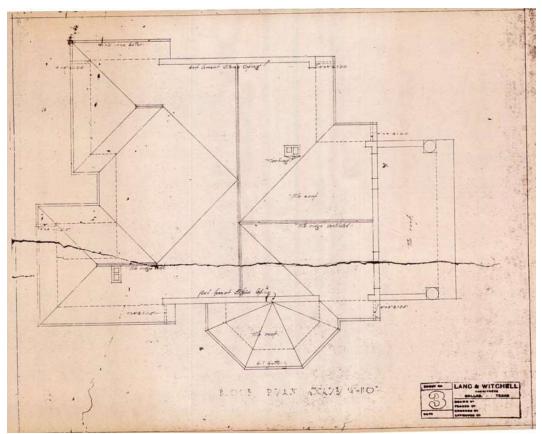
Original Lang and Witchell Roof Plan – Sheet 3
